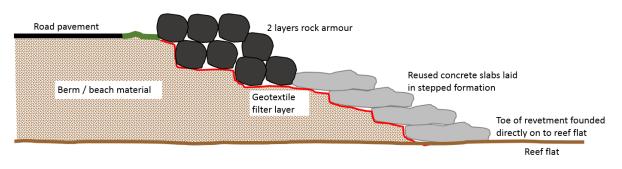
Cross-section of the proposed reconstructed revetment at Paal.
